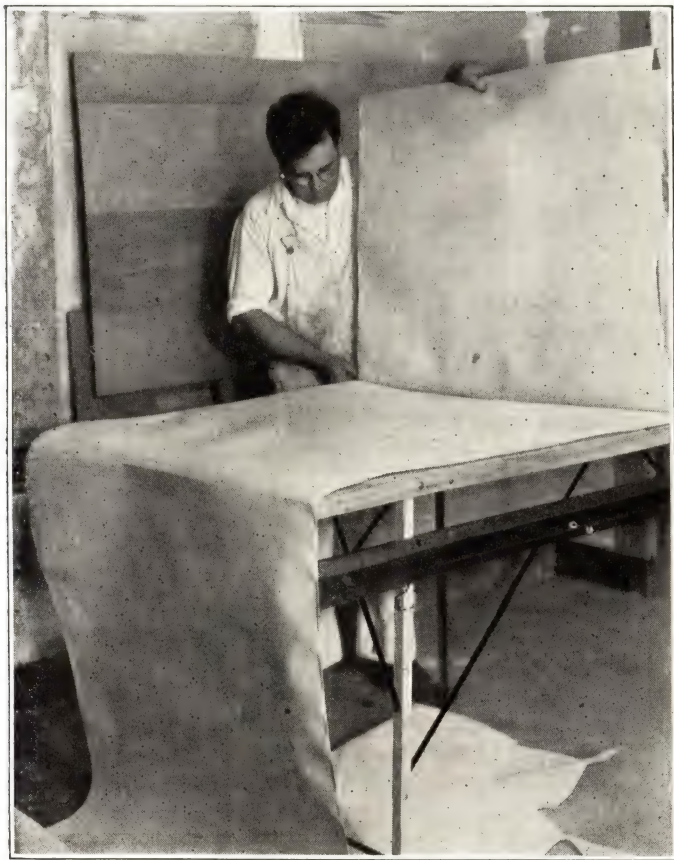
After brushing on the paste, fold the paper about one third its length with paste sides together.
